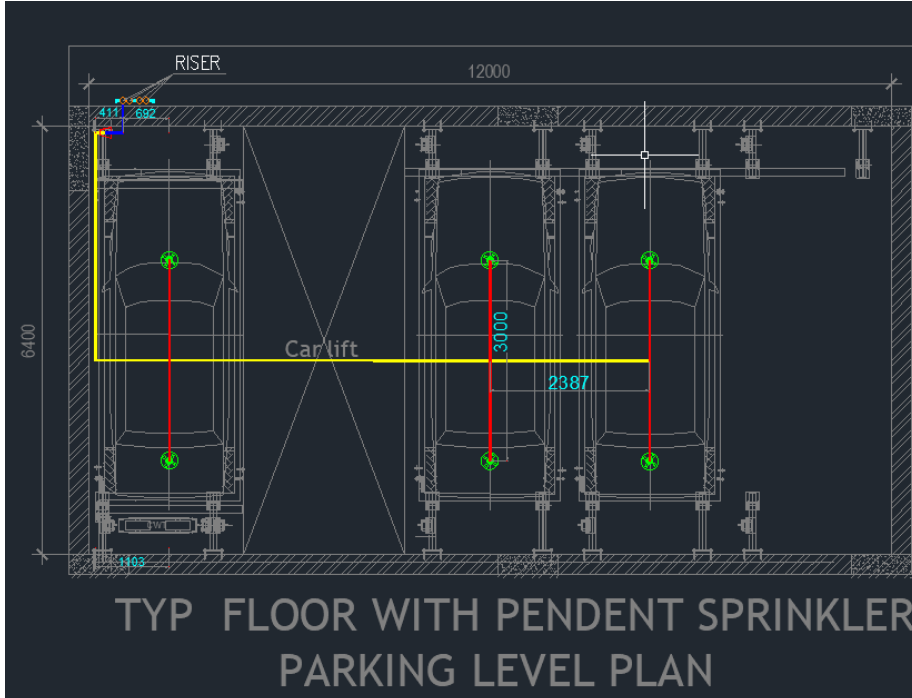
layout of sprinkler system for FAMCP (option 1)
